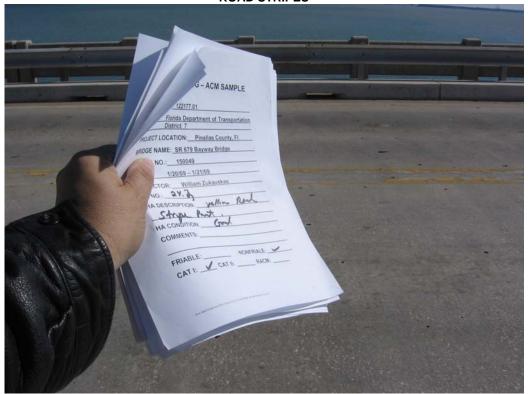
01/21/09 - SAMPLE 24.3 - HA 24 YELLOW PAINT ROAD STRIPES
